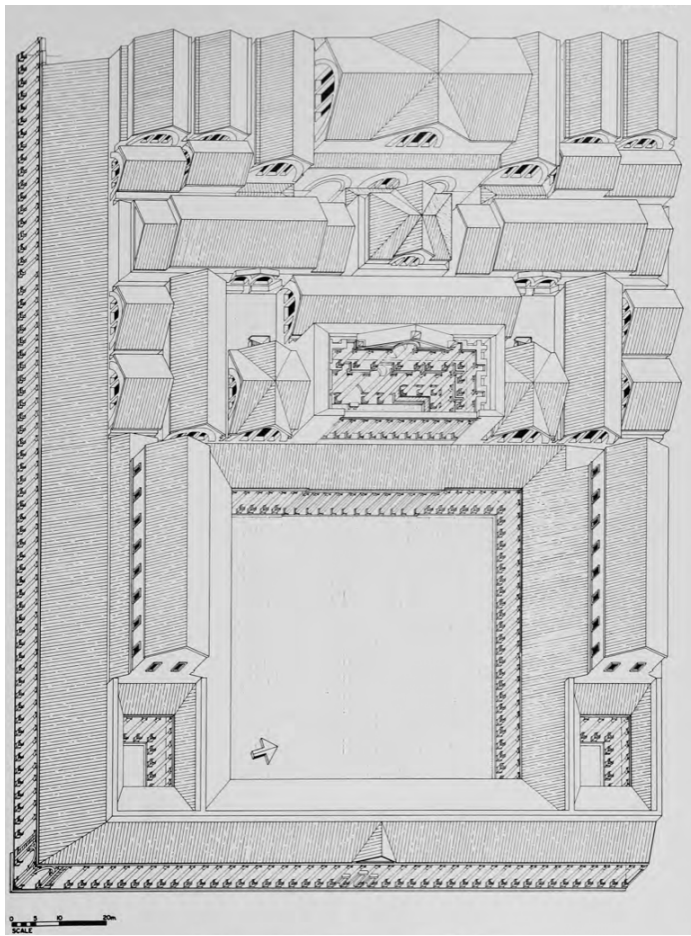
Restored hypothetical axonometric plan of the roofs.
